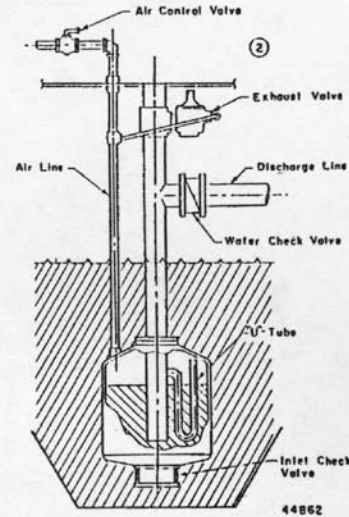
Liquid fills the ejector and discharge pipe until it starts filling the "U" tube from the discharge pipe. This stops air venting out the exhaust valve.
